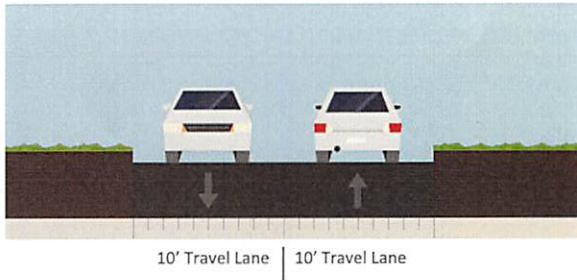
TYPICAL SECTION SOUTH OF COLLEGE STREET
